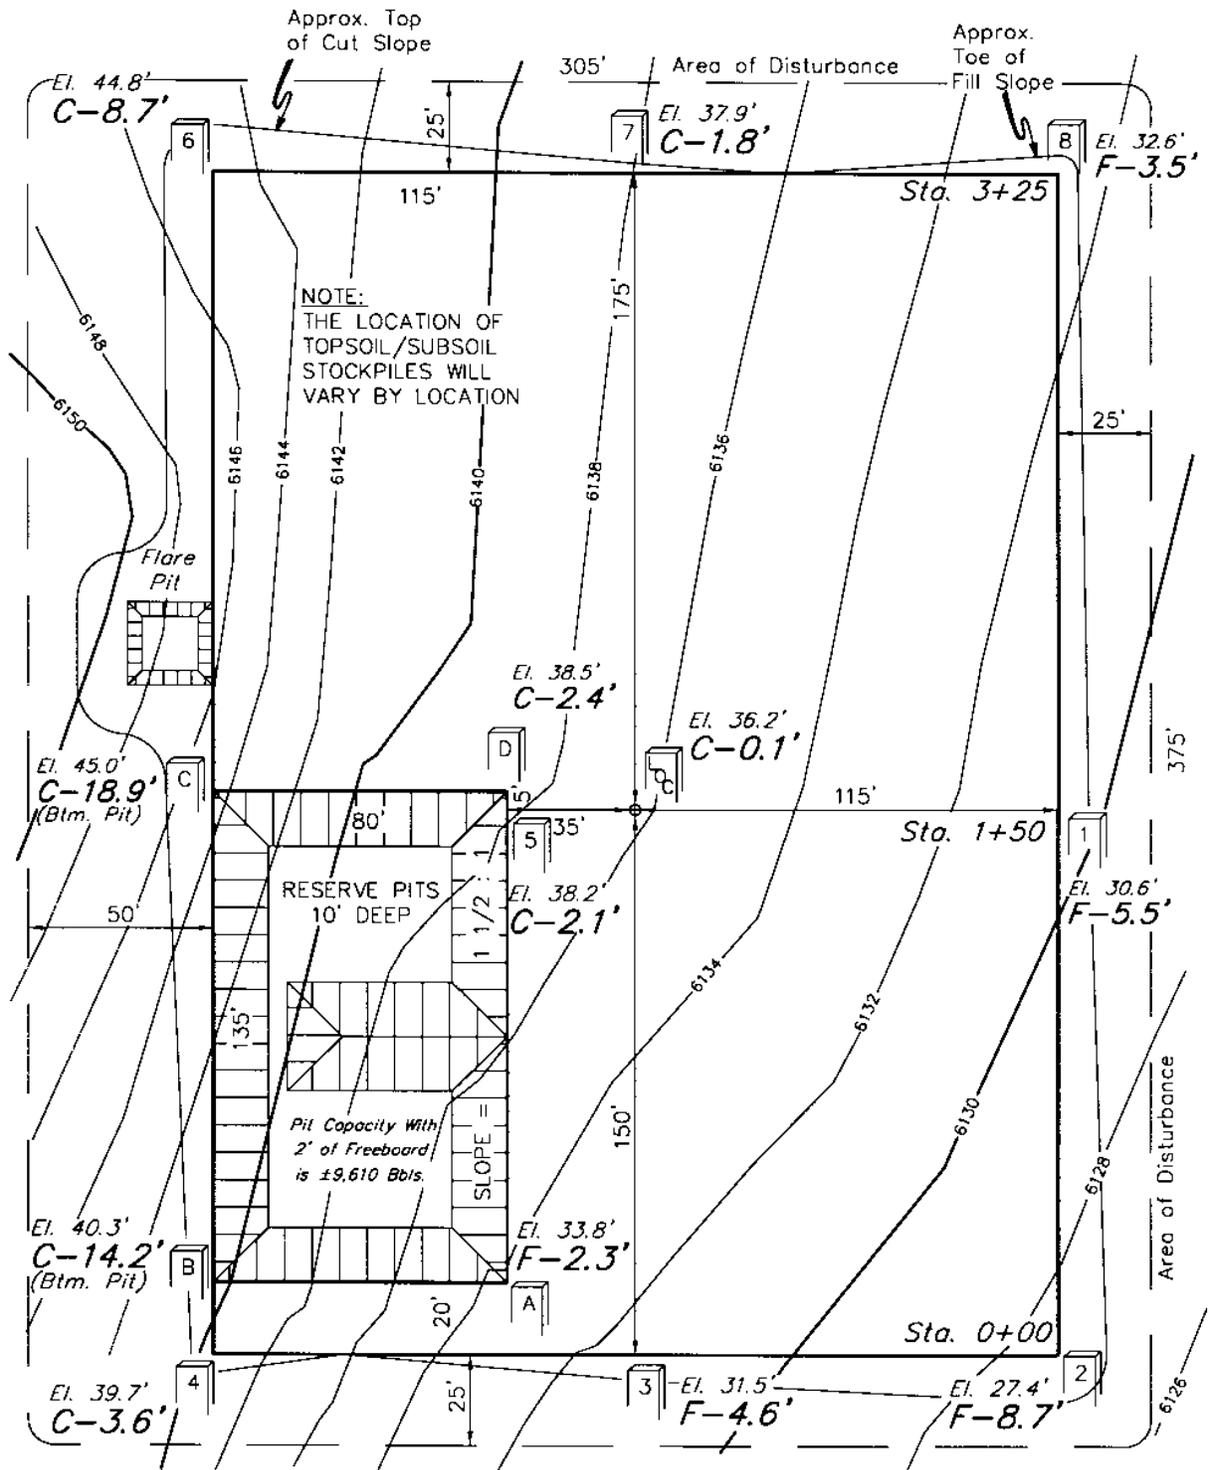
Typical Location Layout for a Well Pad with One Well Bore
